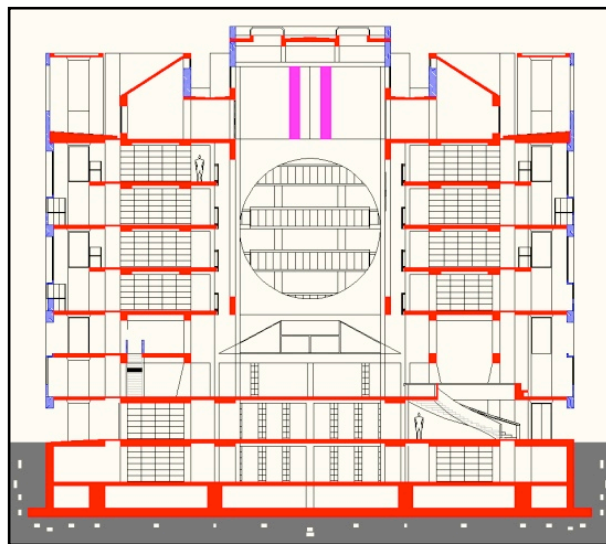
Section , blue hatch showing brick, red concrete, and pink showing concrete skylight bracing (Re-Drawn by Author)
